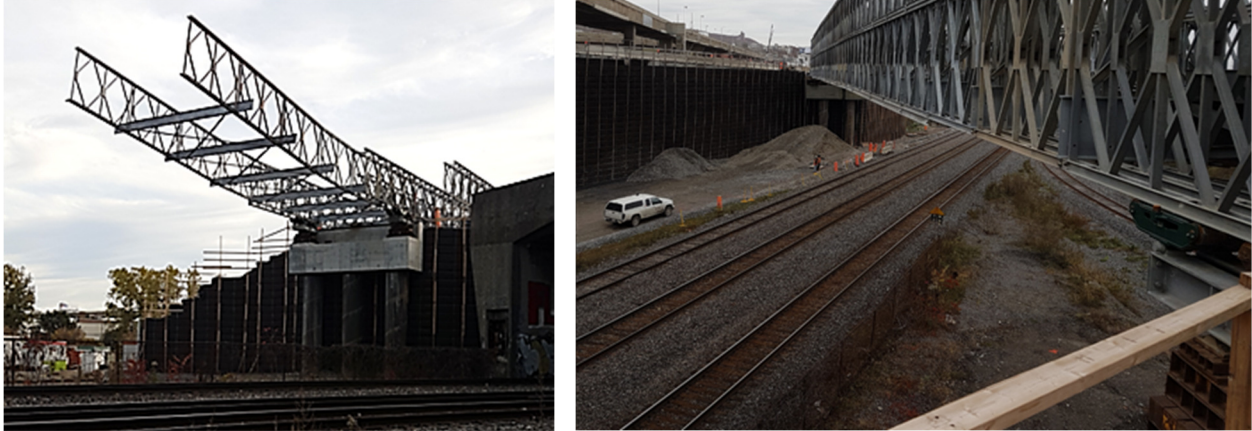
Modular steel bridge pushed onto piles from temporary MSE wall
